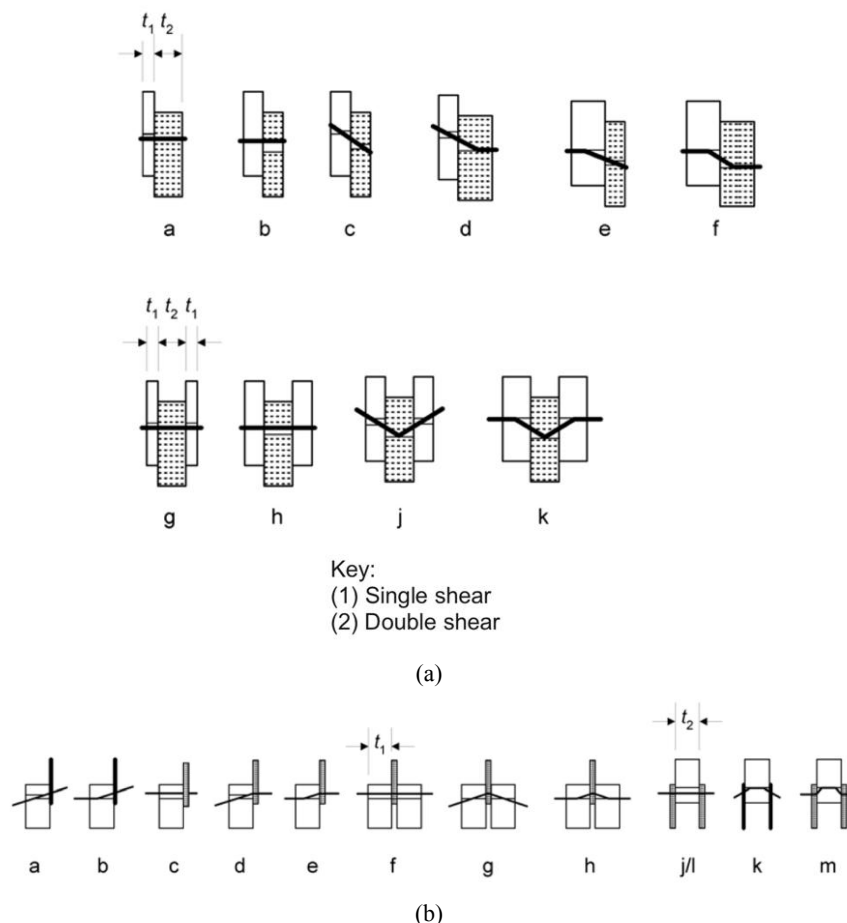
The failure modes of (a) timber-to-timber connections, and (b) steel-to-timber connections that are considered in European Yield Models (EYMs) [2.62]
